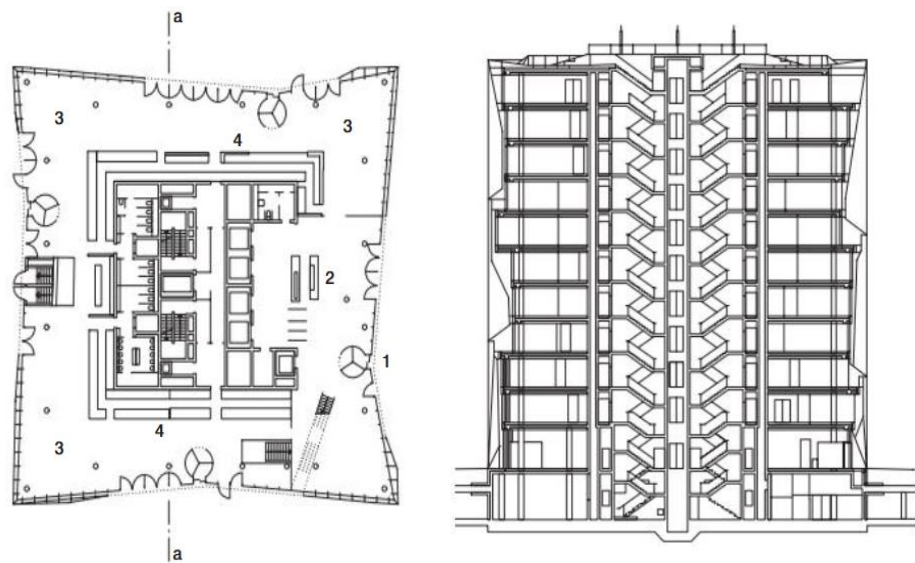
Ground Floor Plan and Section A-A Drawing of Cube Berlin.
